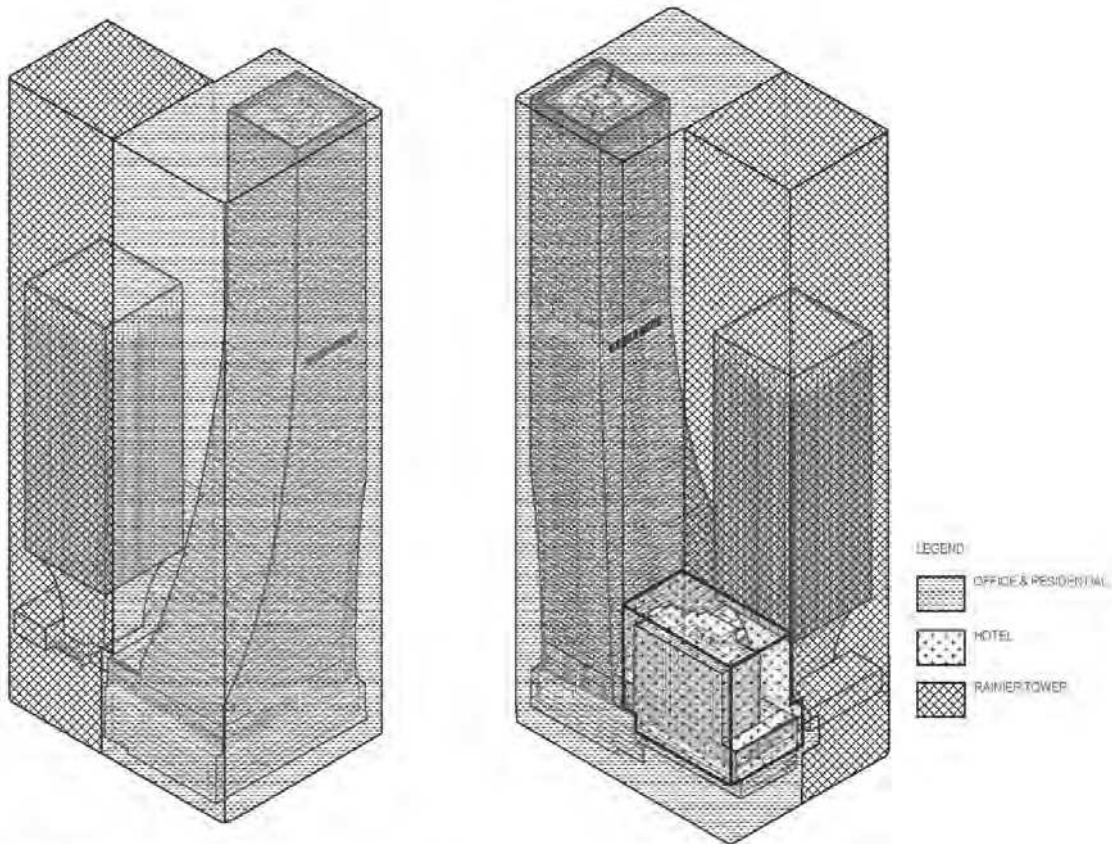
PROJECT SITE PLAN (AXONOMETRIC VIEWS)
